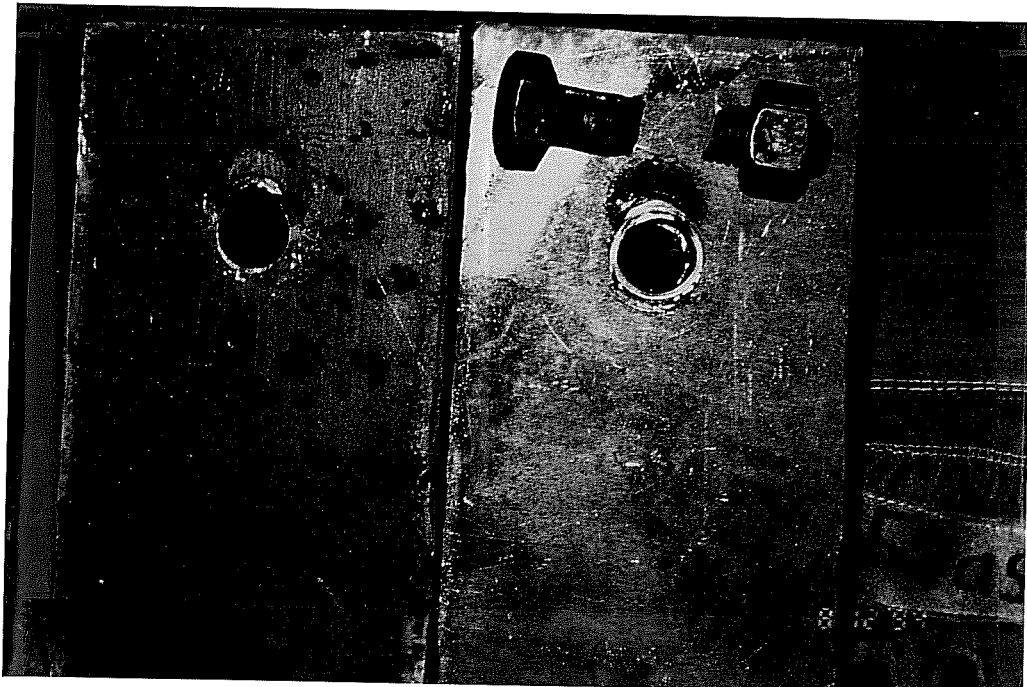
Typical test bolt after failure, tested in a tension splice
